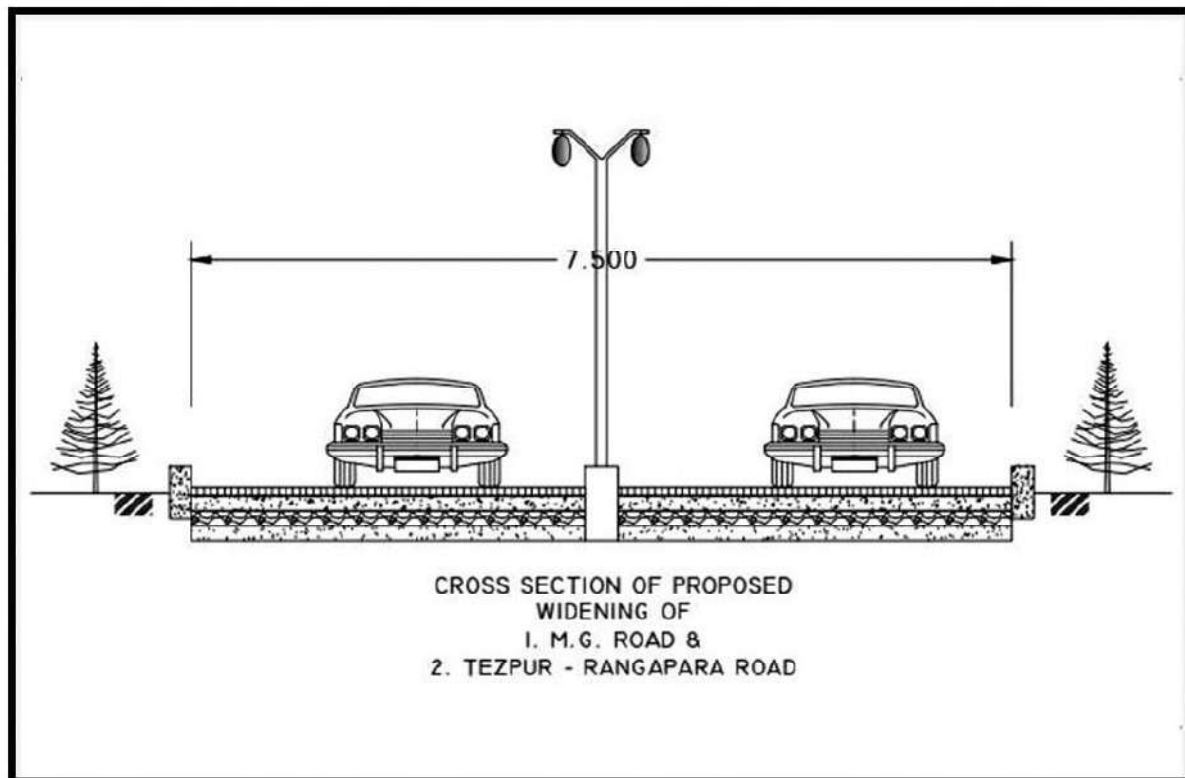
Cross-sectional drawing of proposed road widening in Rangapara Master Plan
